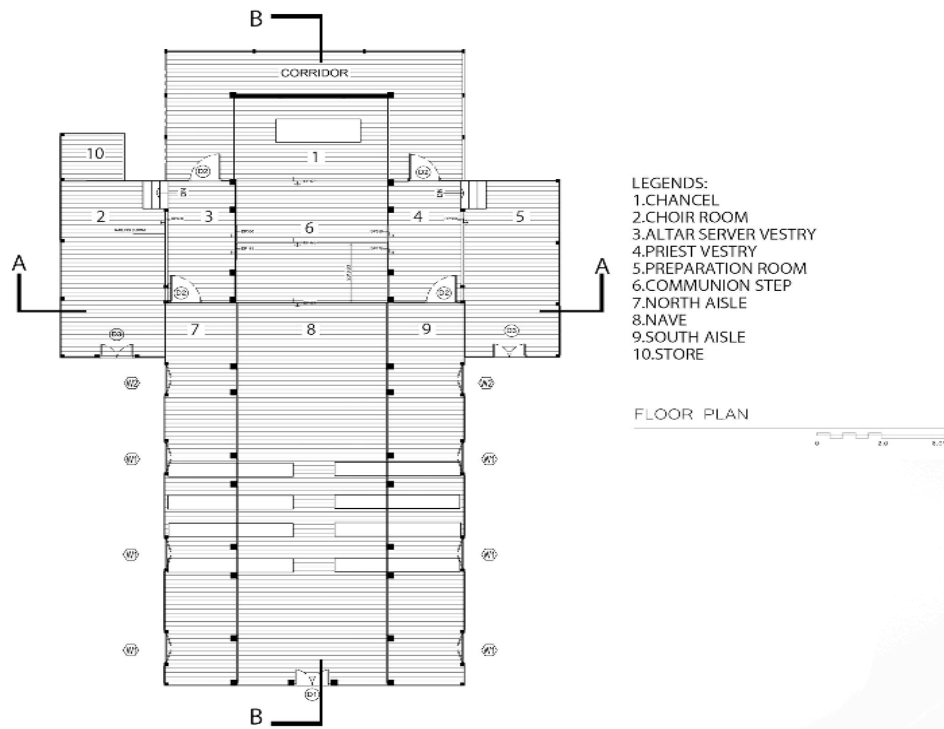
Ground Floor Plan of St. James Church, Kampung Quop
